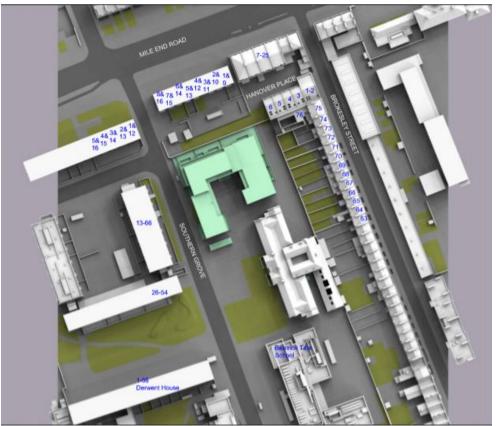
Plan view of neighbouring buildings in relation to proposal.
